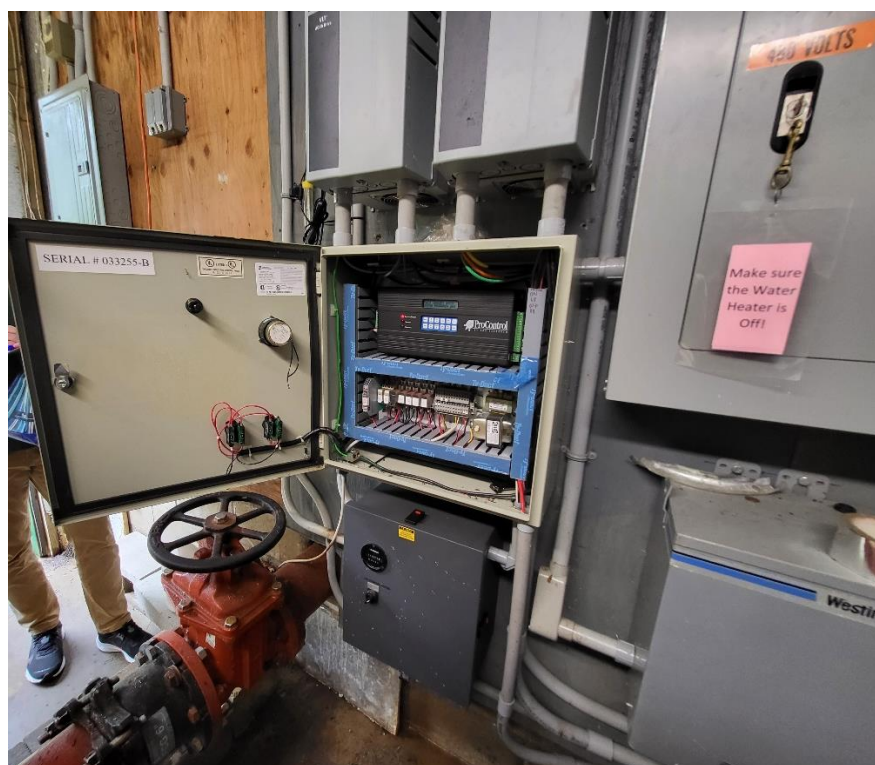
Existing SCADA panel in Well GPW 1 pump house. Taken 6/27/23
